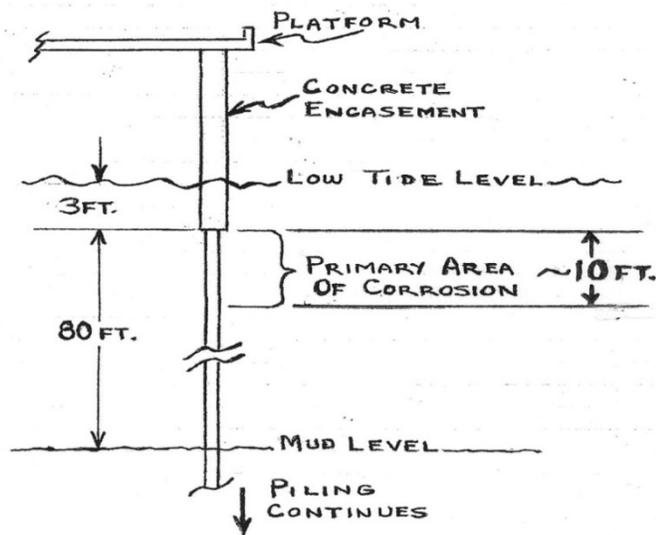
Cross-sectional Configuration of an Installed Pipe Piling
